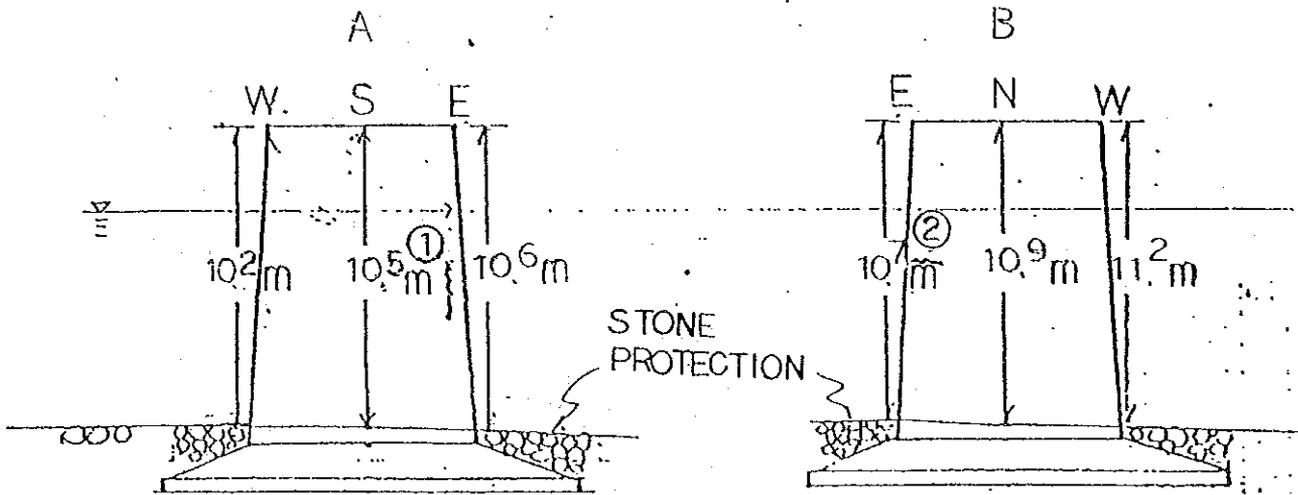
Location of Cracks at Pier No.5
